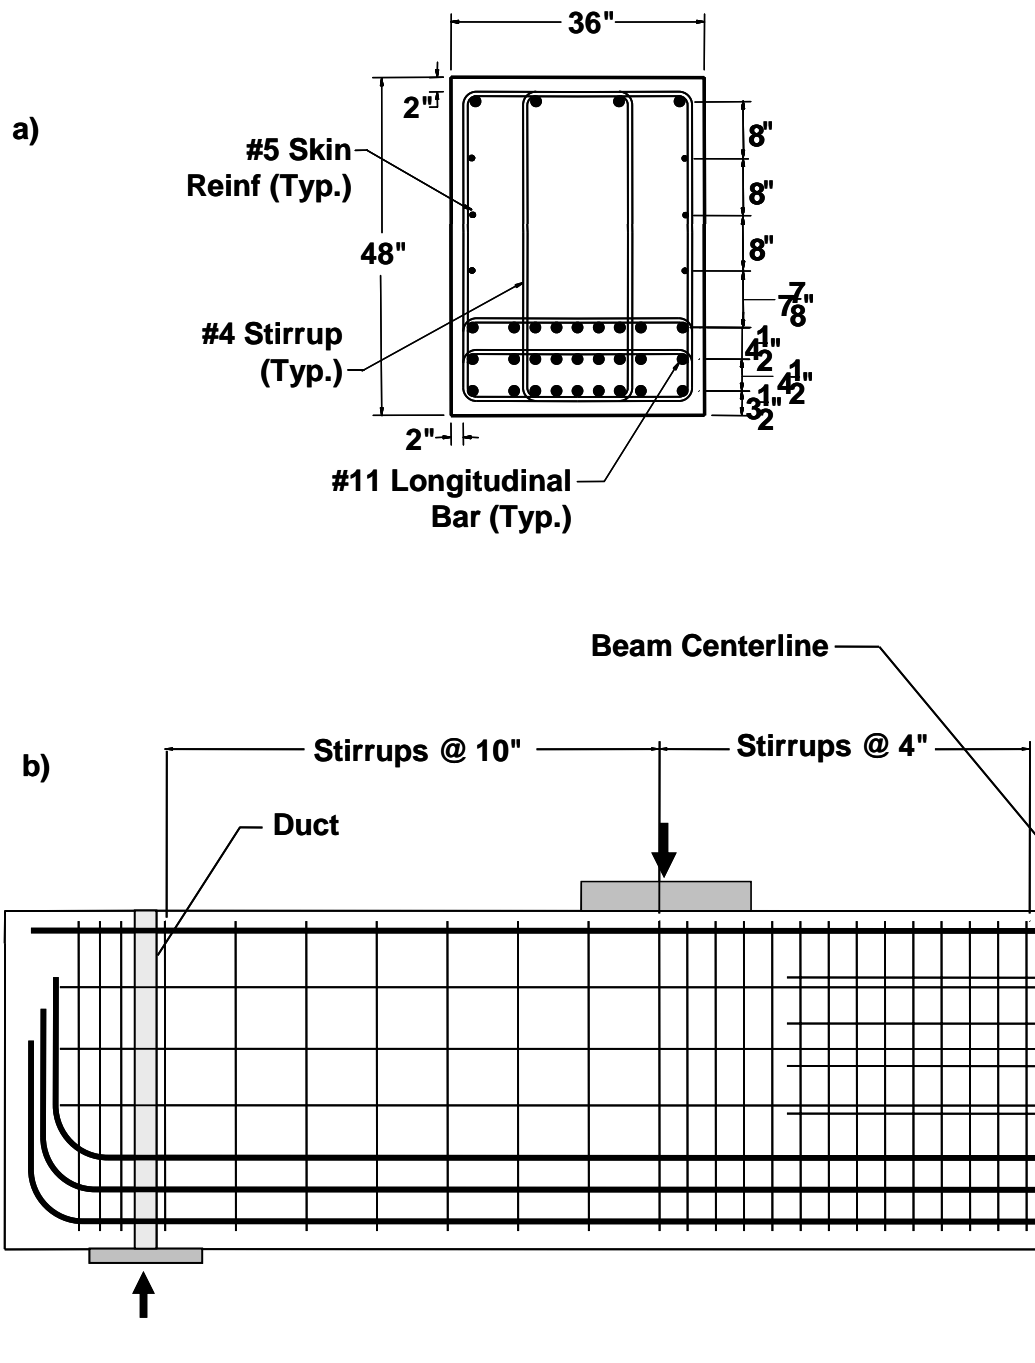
Shear span 3A a) Cross-section; b) Elevation
